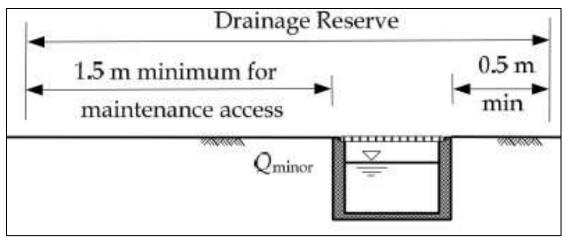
Typical Cross-Section for the Primary Storm Water Drains
